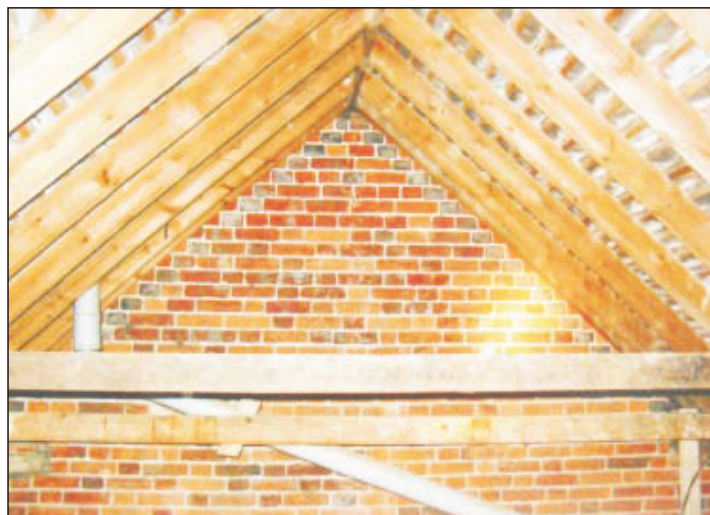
Western extension roof, looking east, showing the west gable of phase two.
